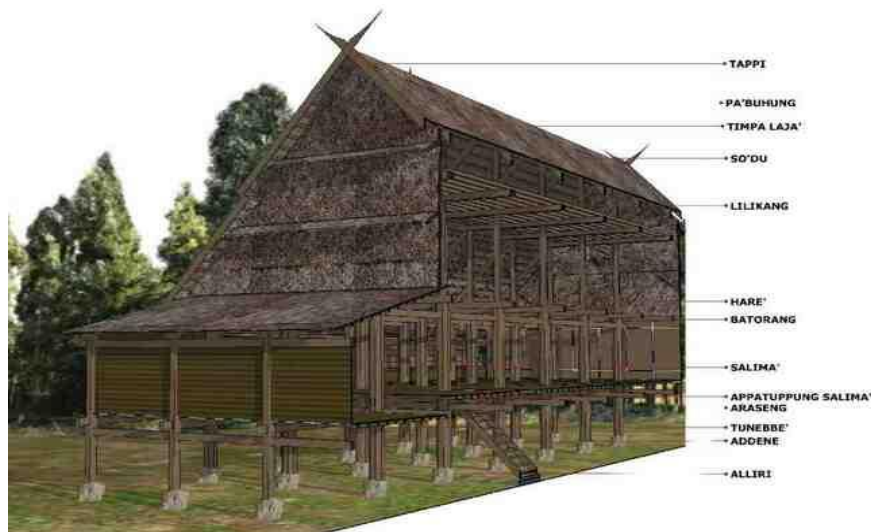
Architectural Longitudinal Section of Puang Matoa's House
